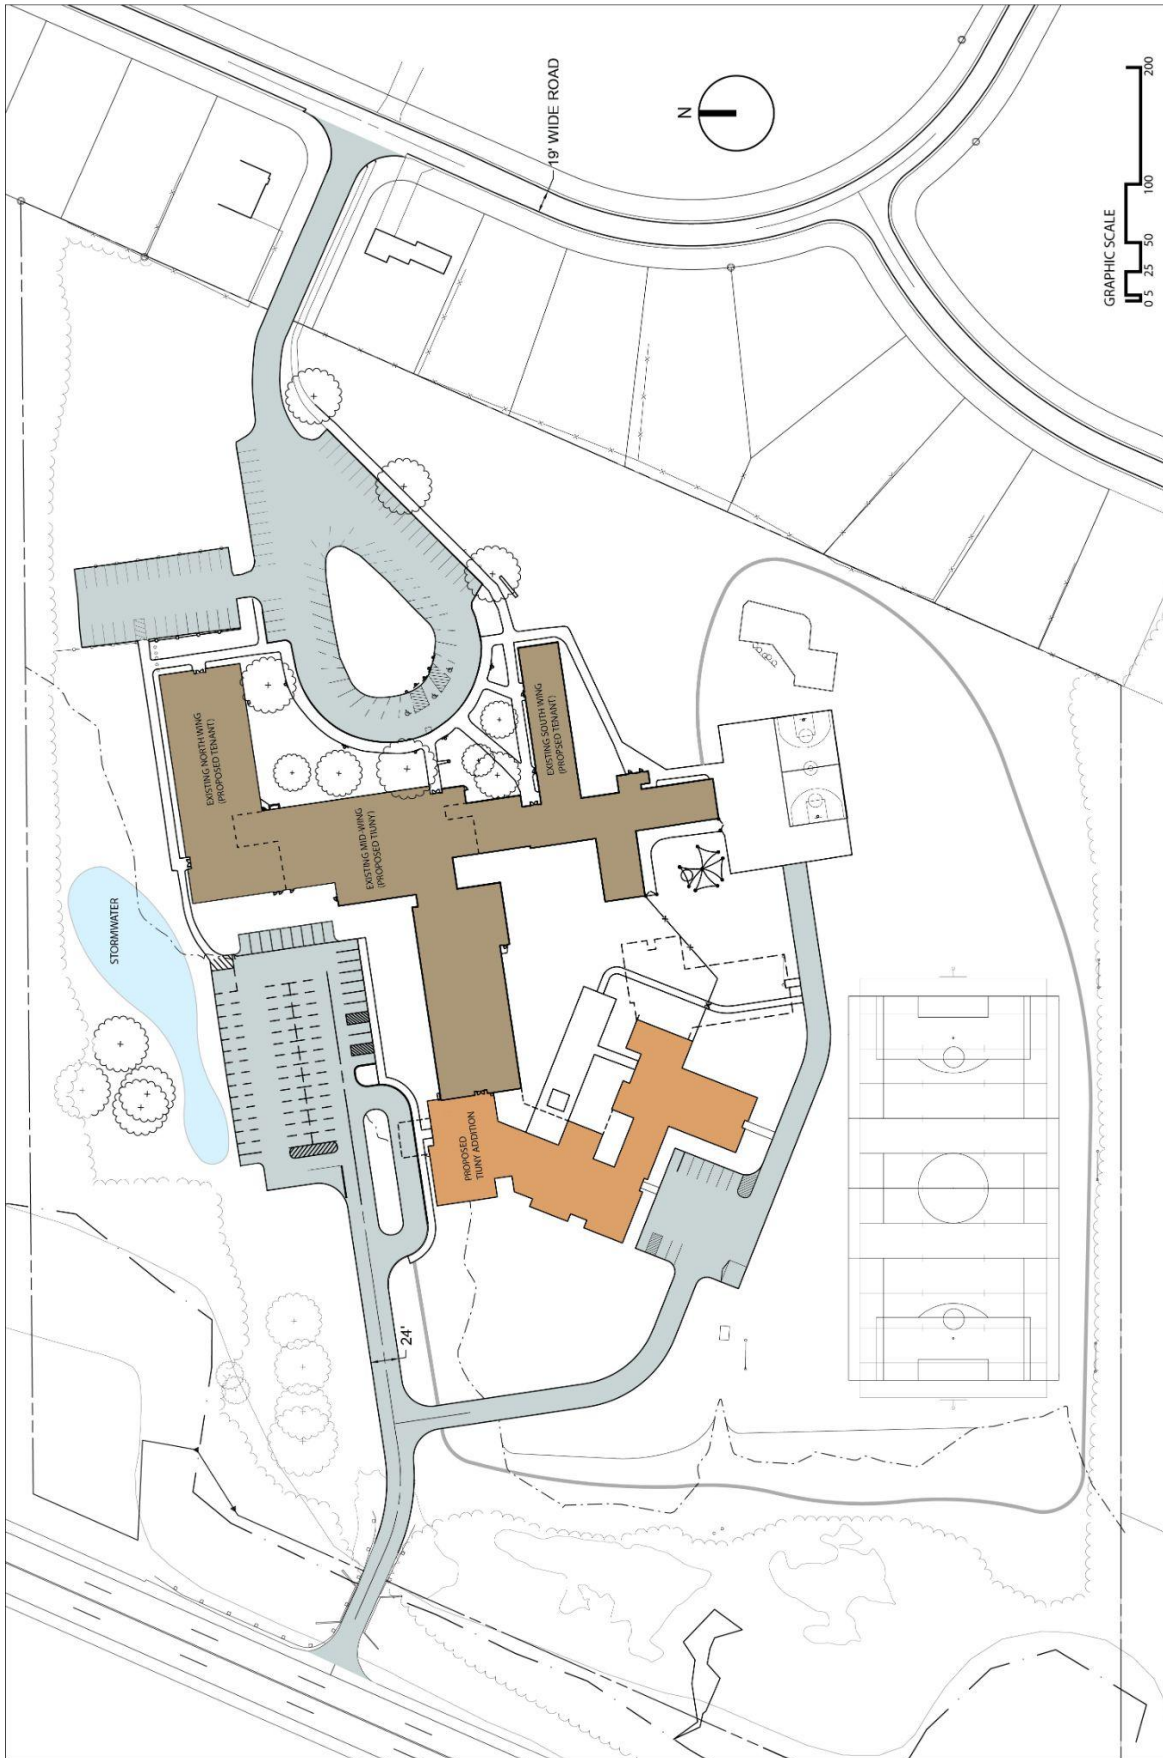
TIUNY Concept Site Plan, proposed 2/16/2022.
